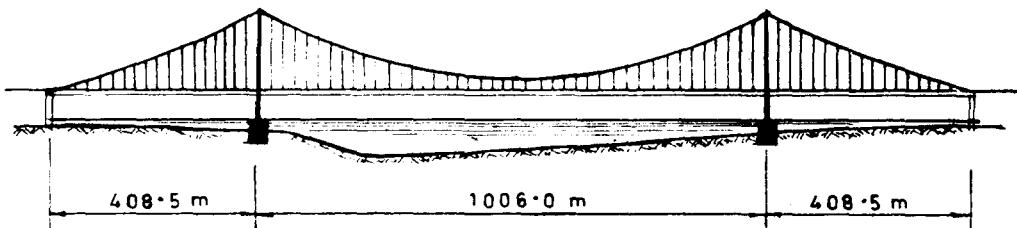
FORTH ROAD BRIDGE (SCOTLAND)
